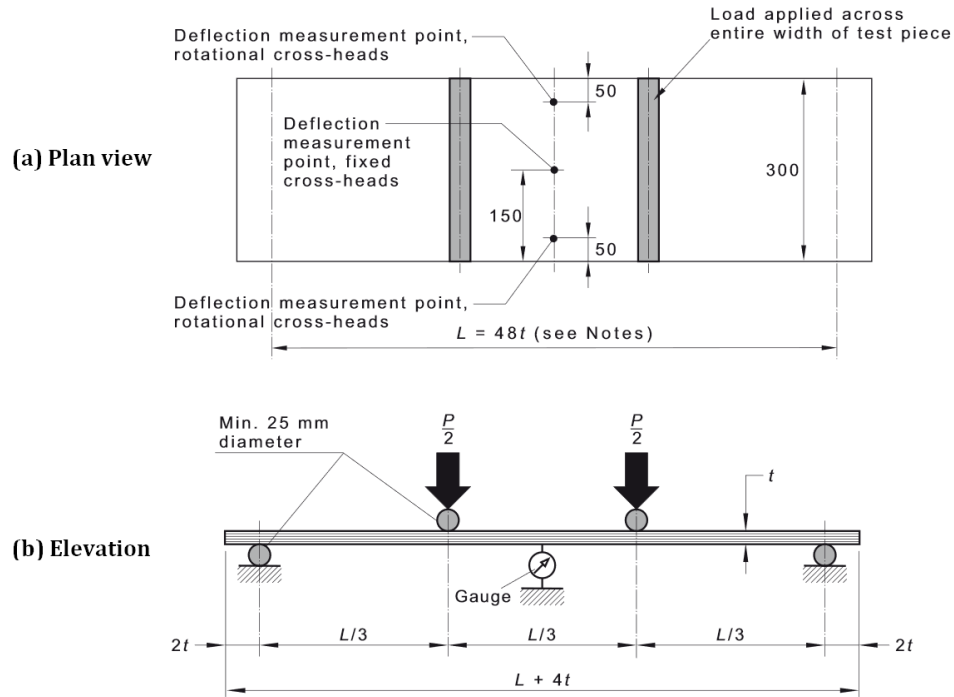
Bending stiffness test configuration for structural plywood [53]
